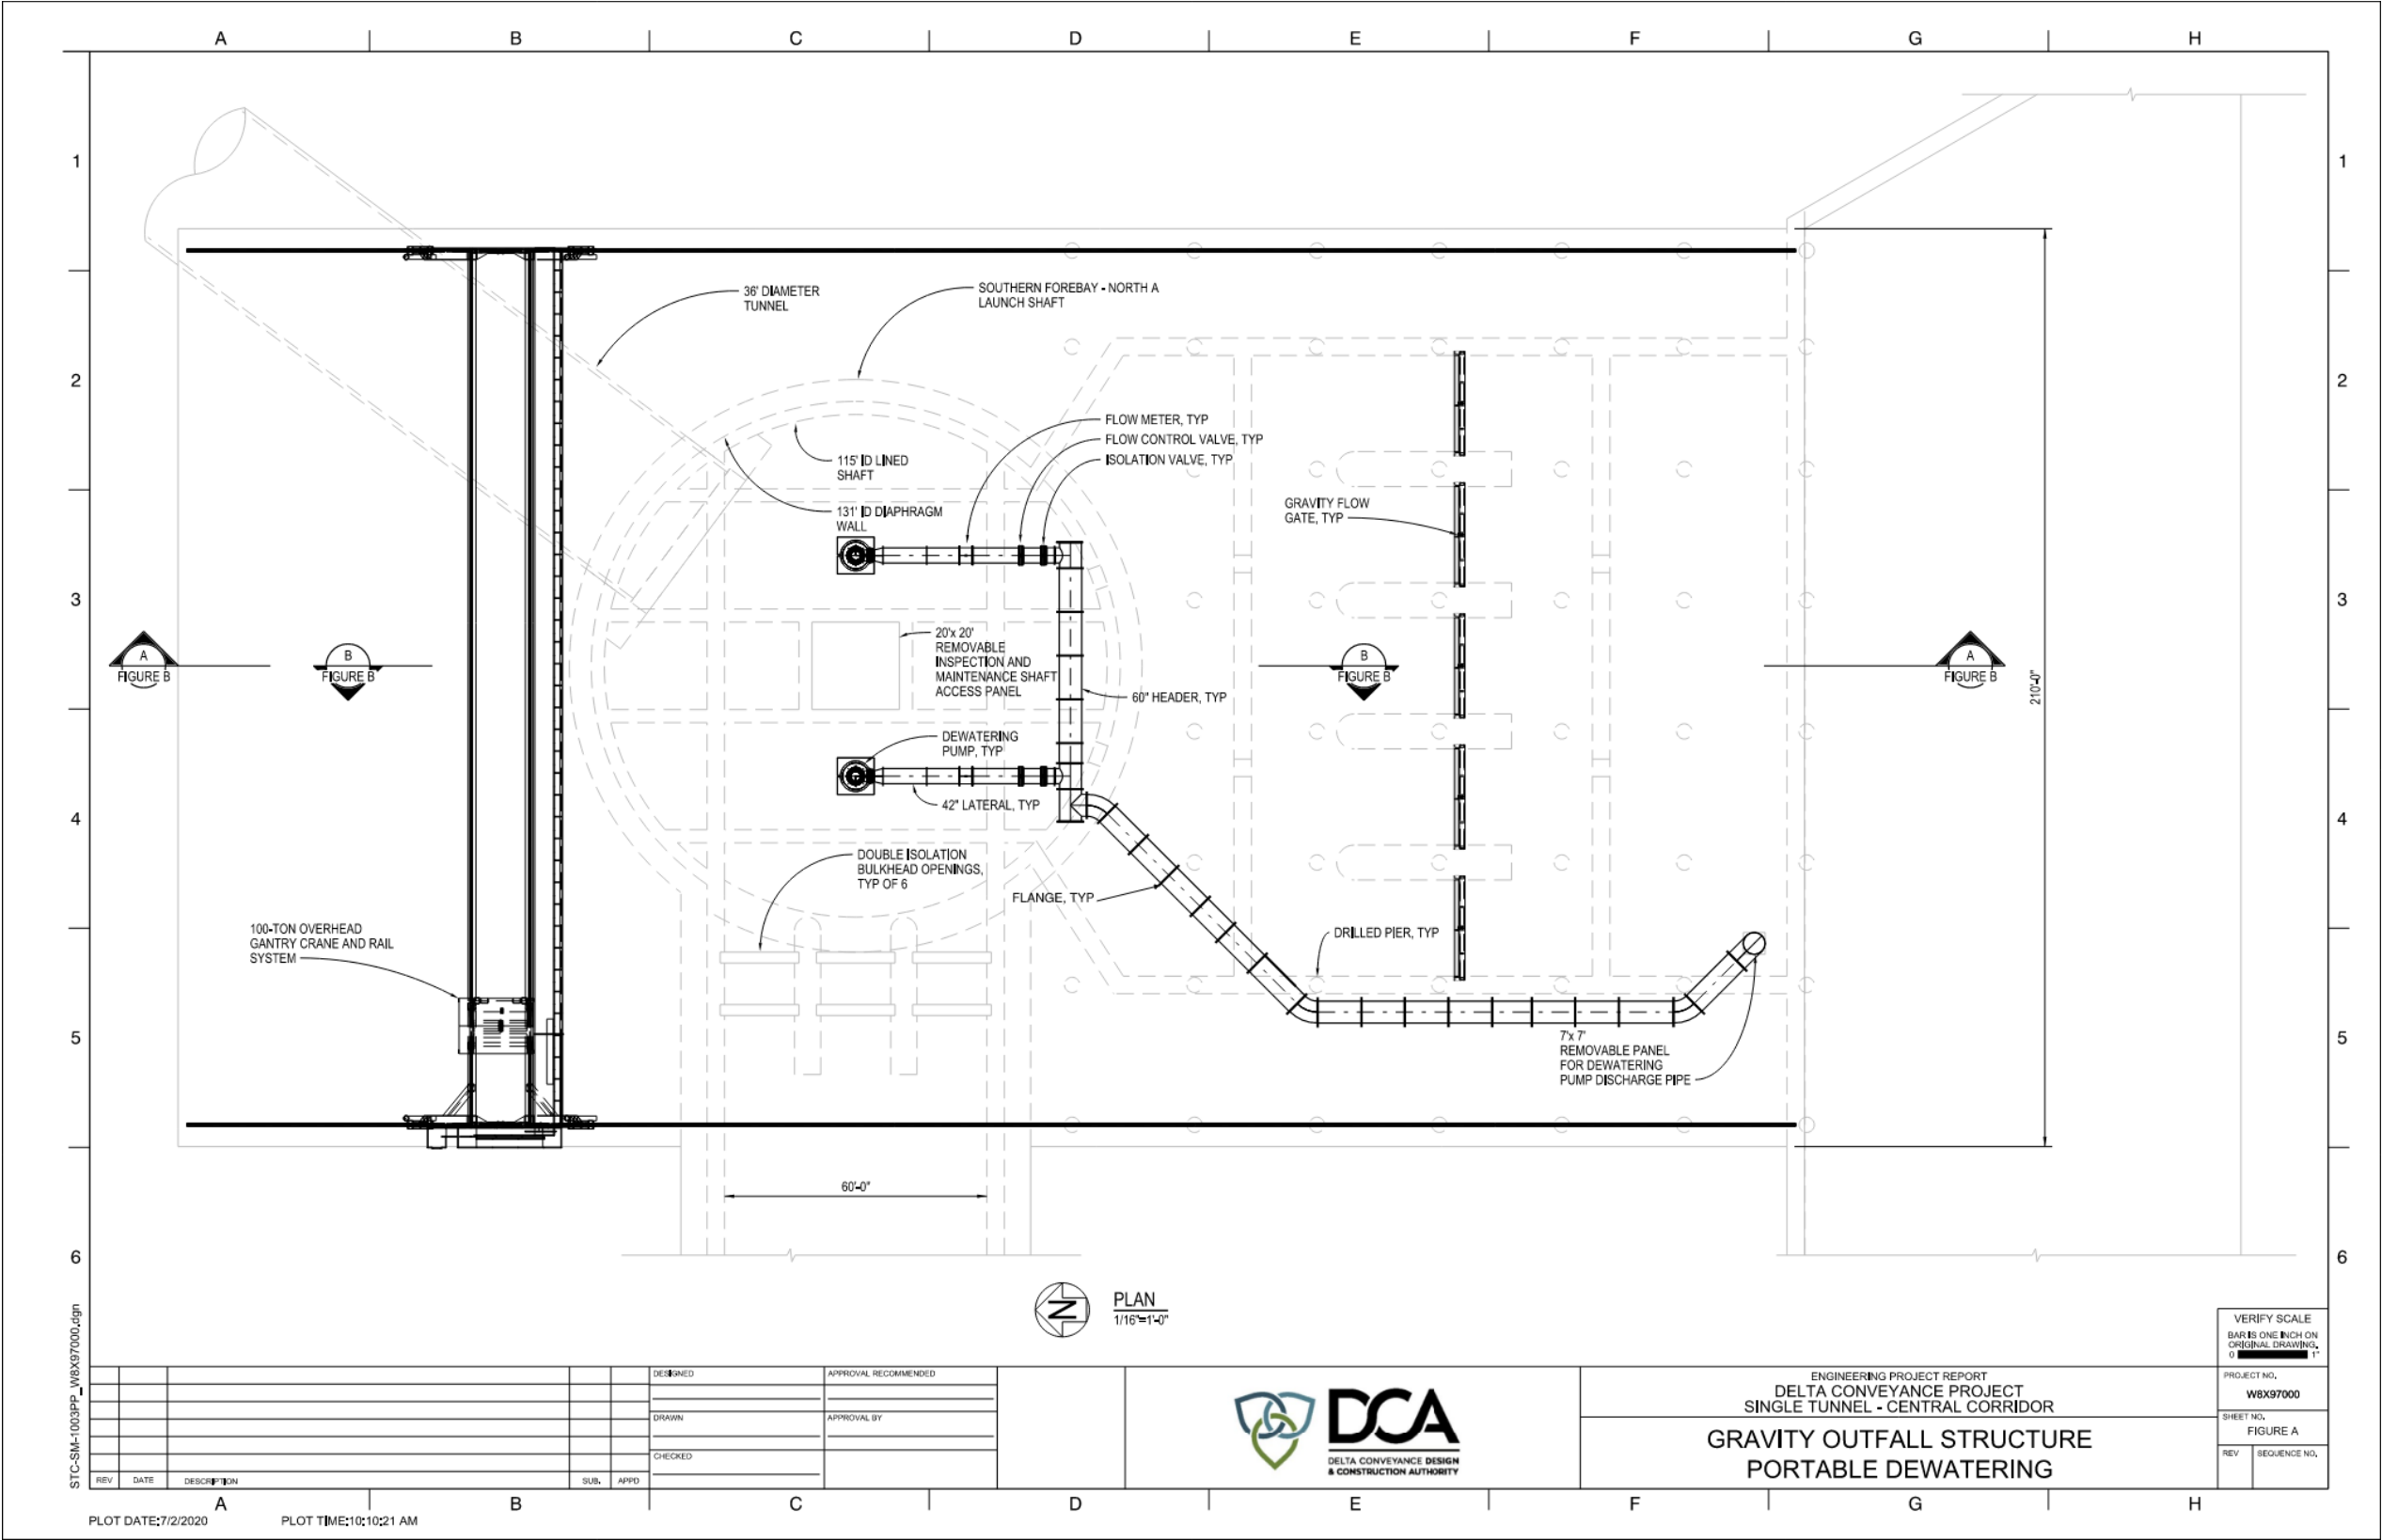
Portable Dewatering Pumping Plant Layout (Plan)
